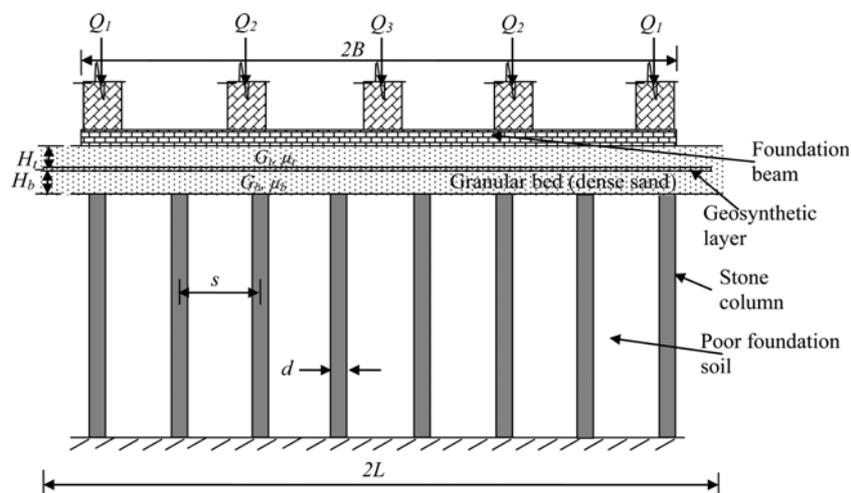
Footing - geosynthetic reinforced granular bed - stone column reinforced poor soil system
